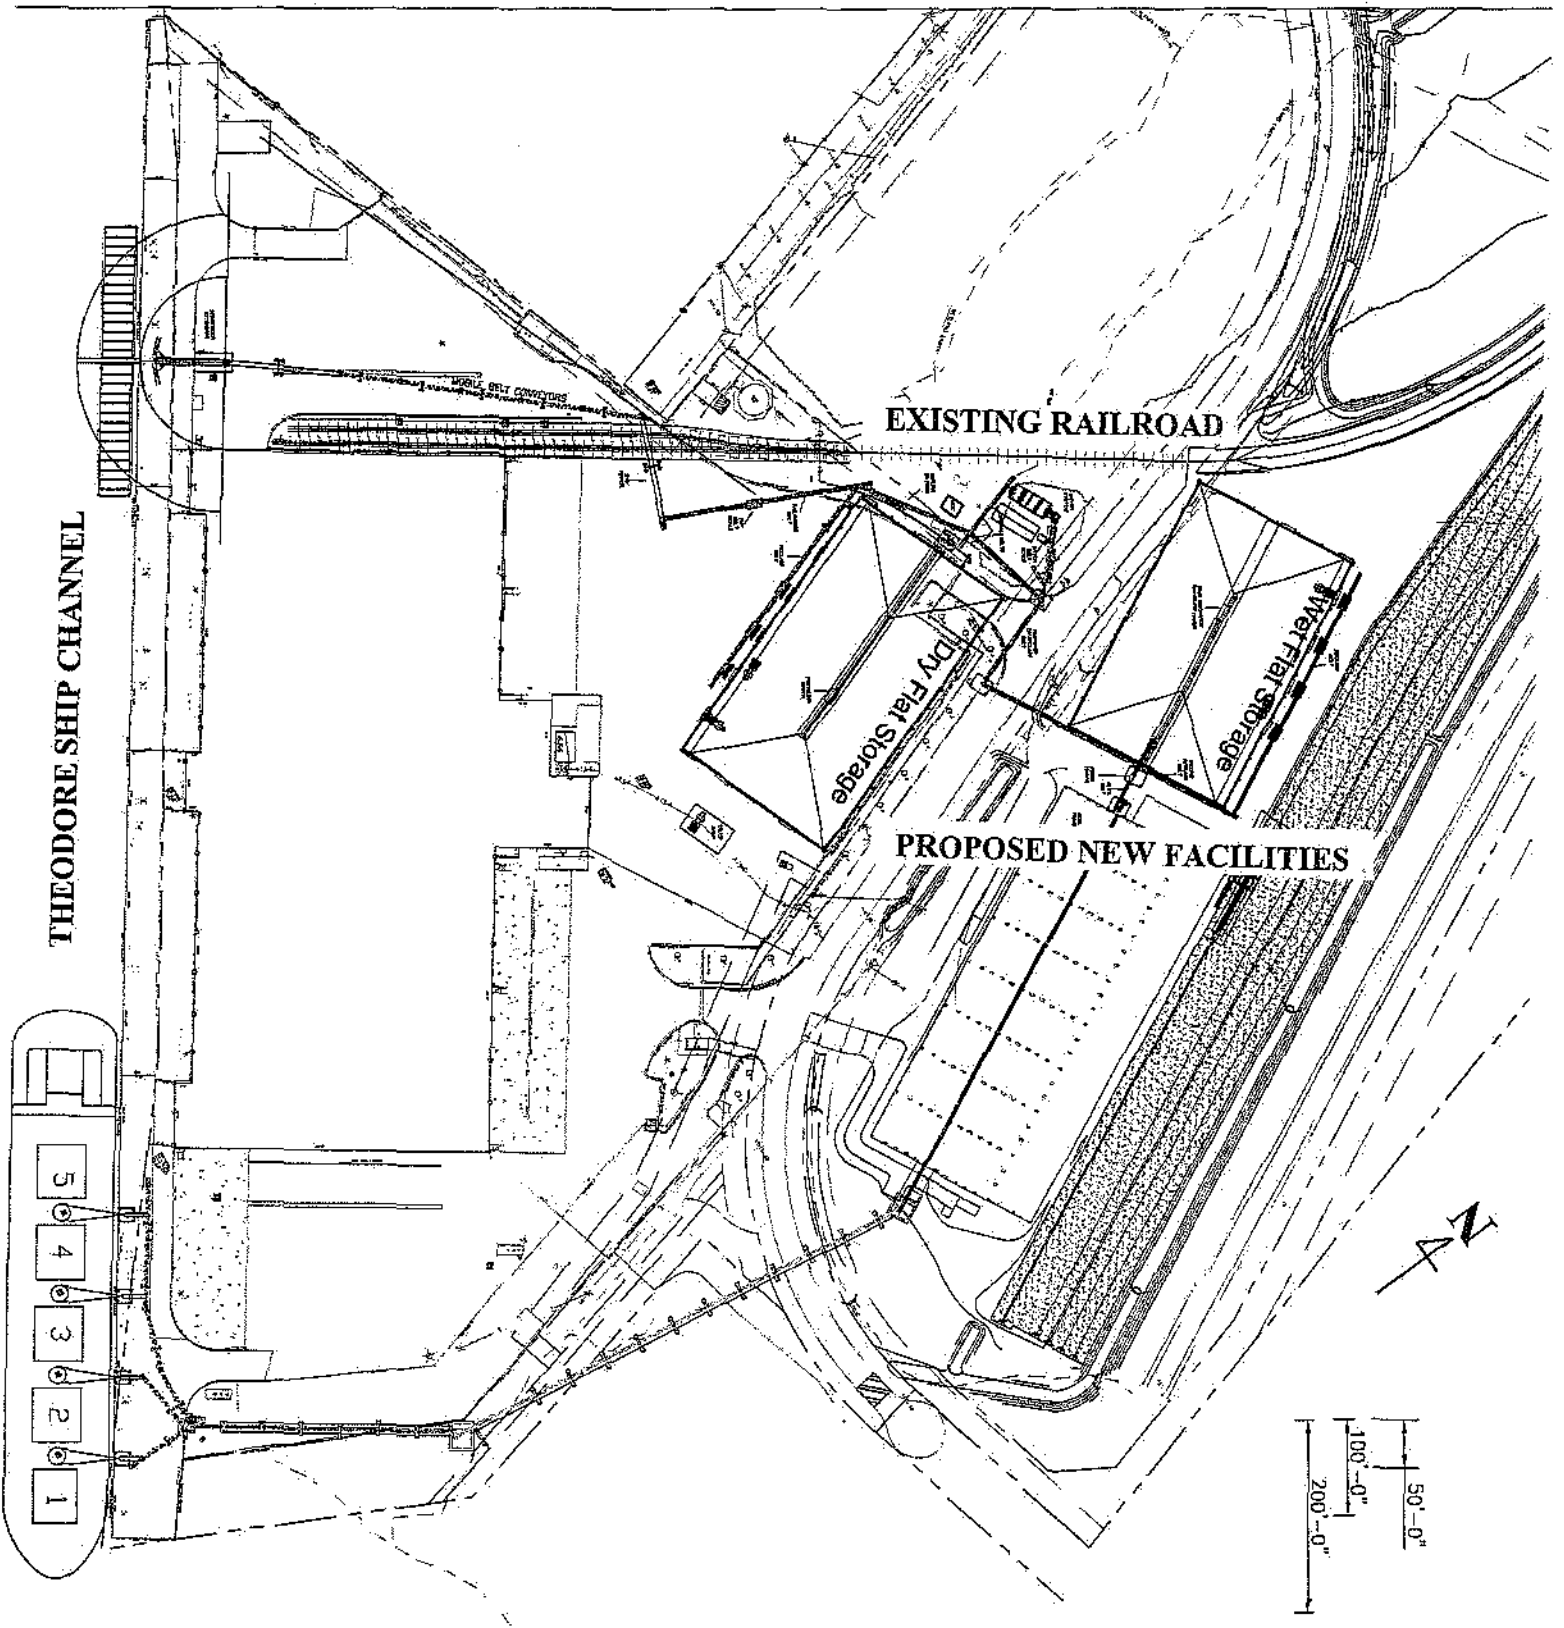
Proposed Site Plan for the Millard Maritime Port Facility Expansion
